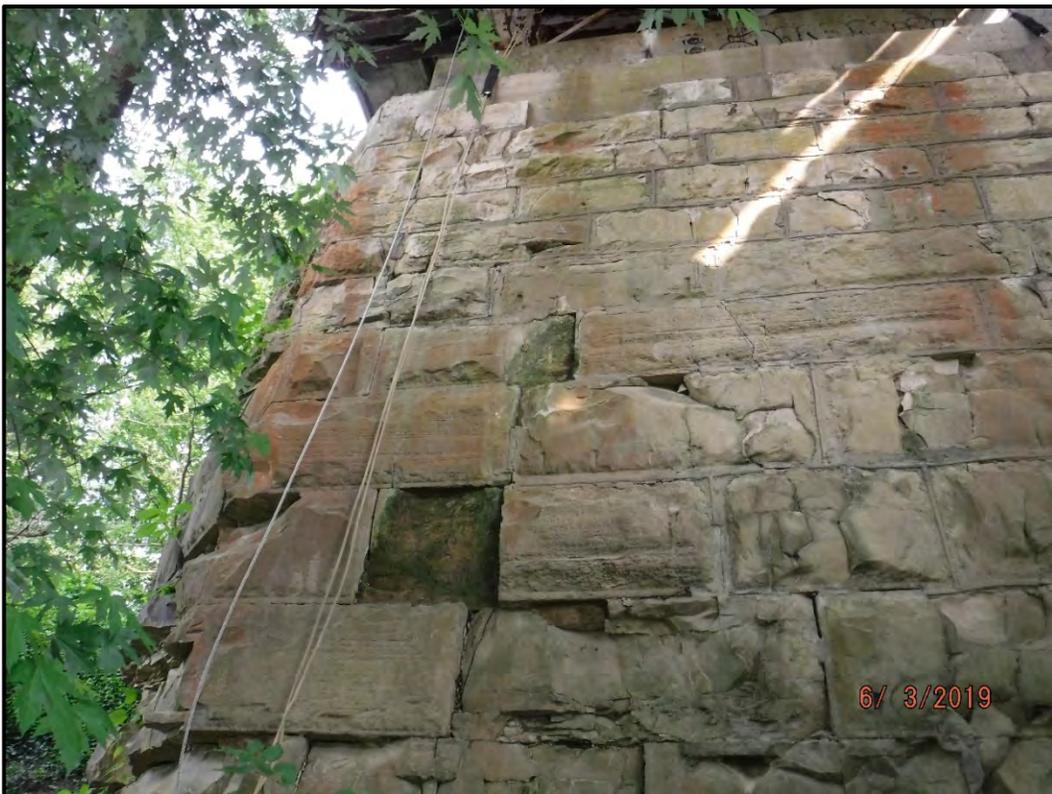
Minor to moderate cracking and delamination on the north end of the Pier 3 west face. Note the higher concentration of cracking exterior of the concrete beam seat.
